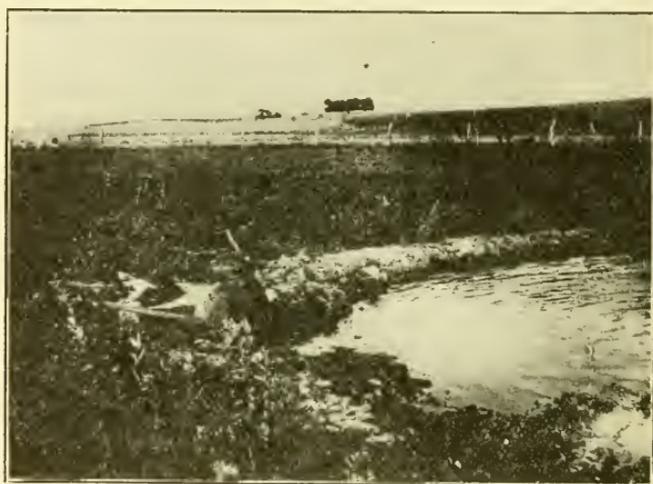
Dam built near head of Dry Run to form pond evidently to furnish drinking water for stock.
